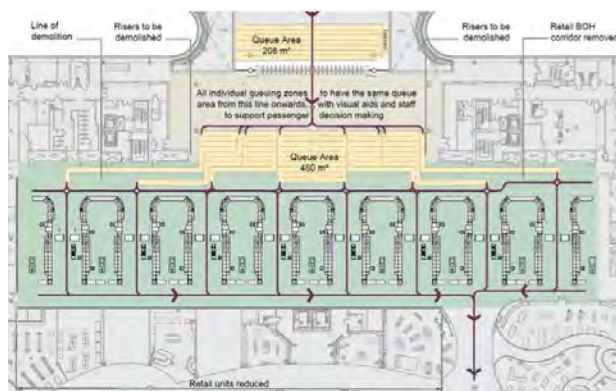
Plan view of new proposed CSA at Terminal 2.
